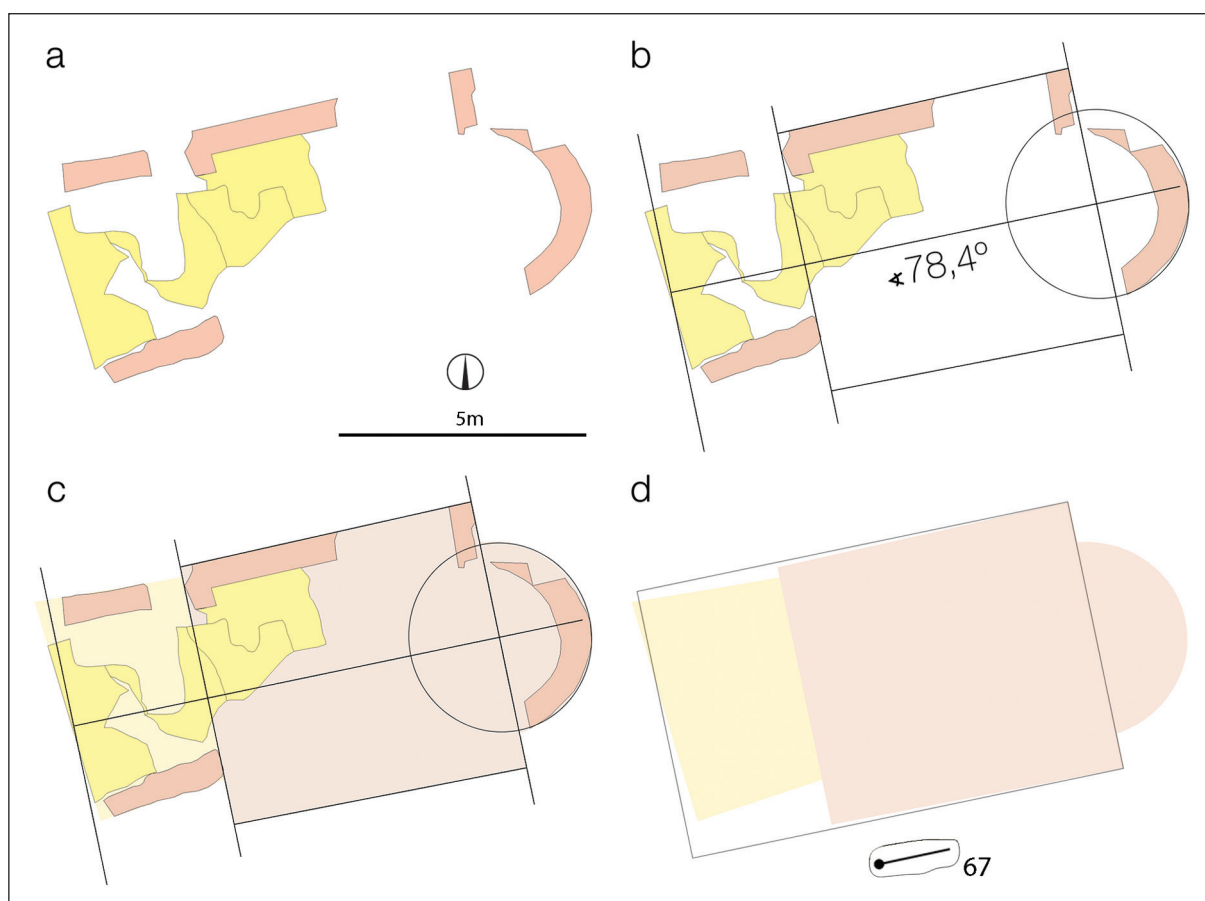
Bled Island, Phase 2b, second building with semicircular apse, reconstruction of the ground plan: a – archaeological remains (yellow for the mortar pavement, brown for the wall foundation); b – reconstruction of the outer walls and the central axis of the apse; c – reconstruction of the ground plan; d – reconstruction of the actual (brown for the nave, yellow for the annex) and the idealised (black line) ground plan.
